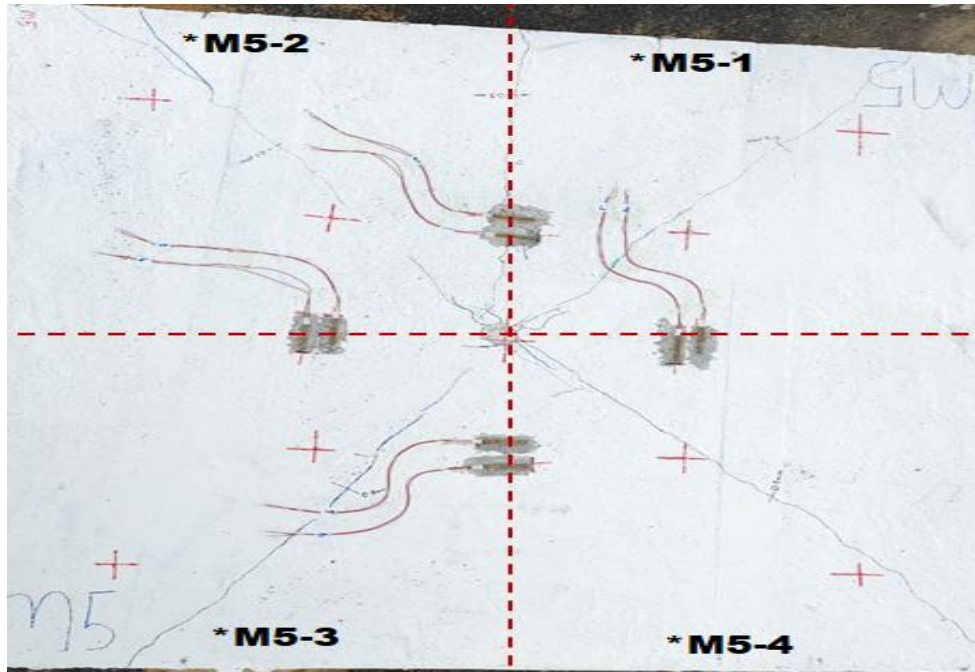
Failure for Slab Specimen M5 (2m drop) – another plan view
